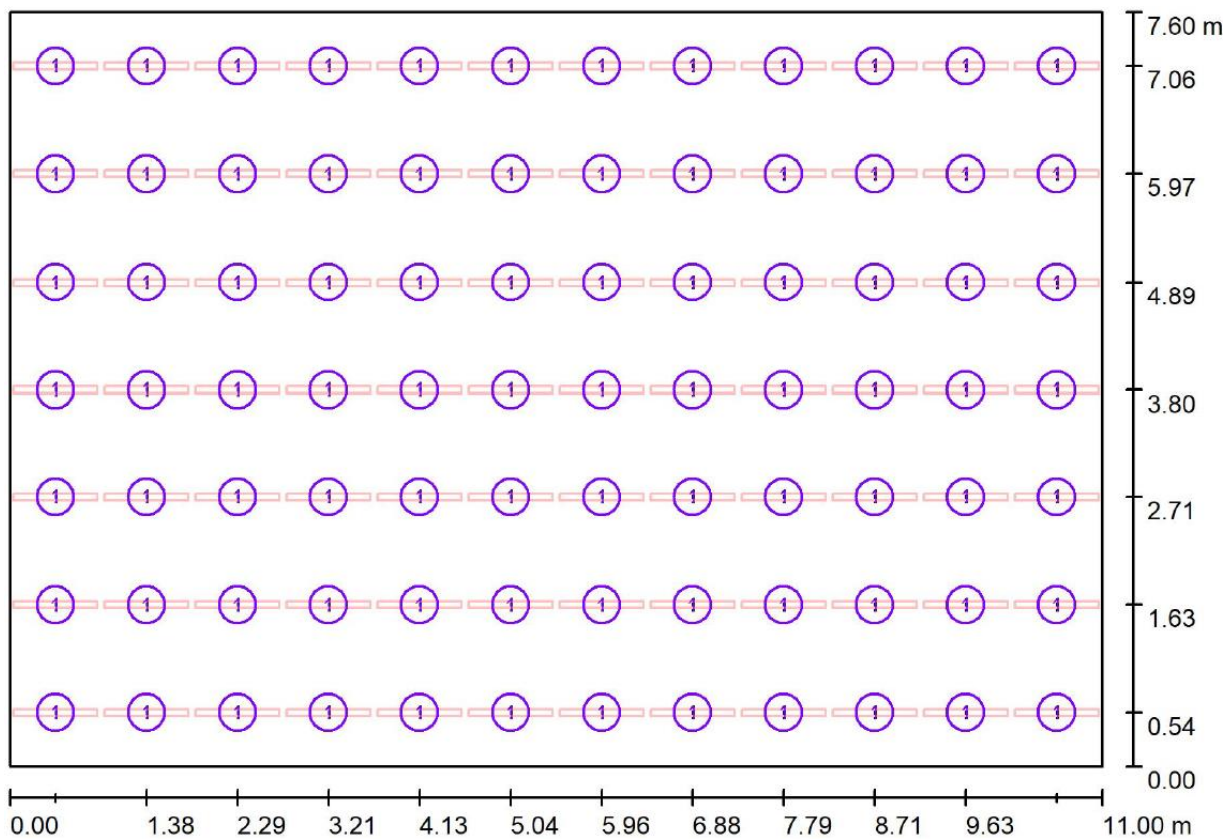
Layout Plan of the chosen Tunable White Luminaire
